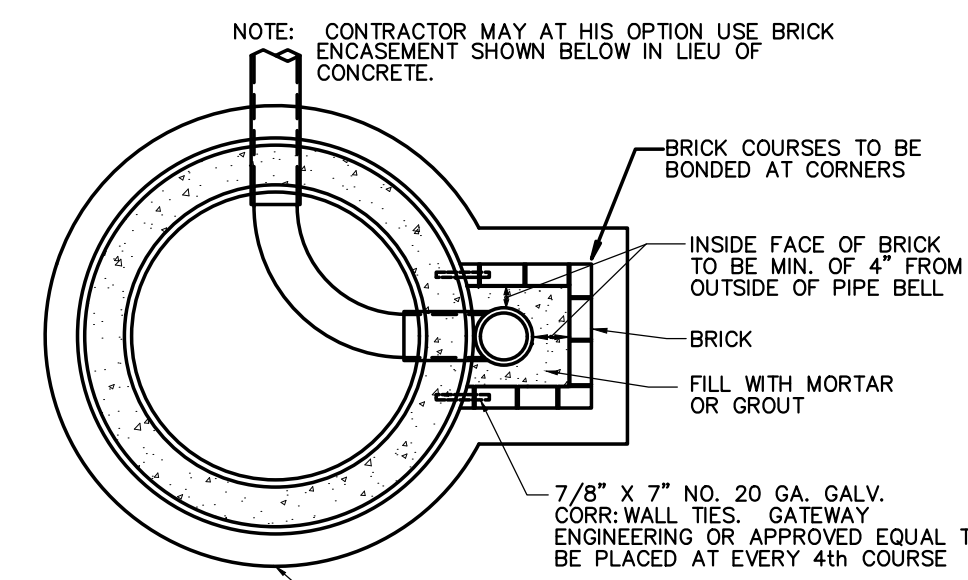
DETAIL OF MANHOLE FOR PIPE 24" DIA. & SMALLER
